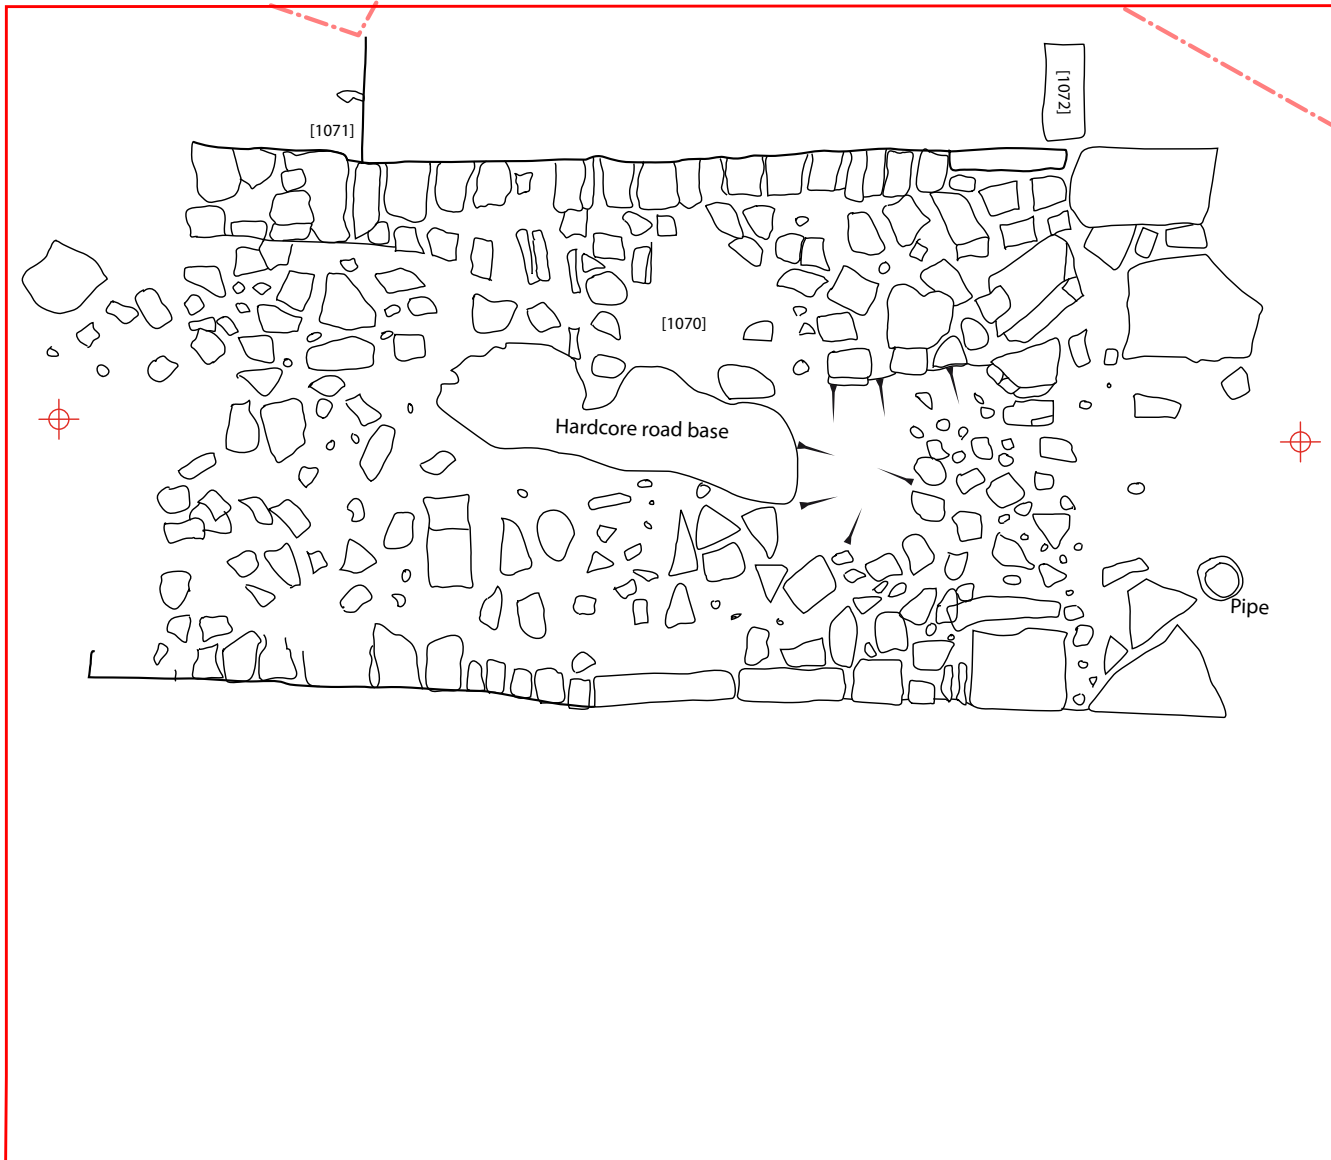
Detail of bridge [1070] plus road [1067] and revetment [1079]
